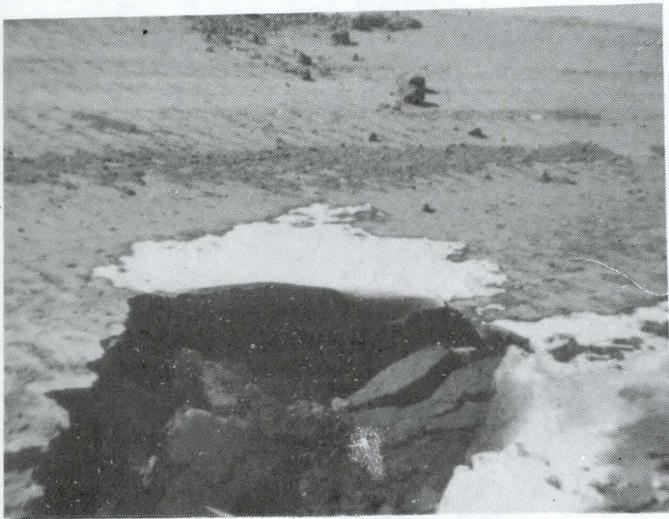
SINK HOLE/COLLAPSE
